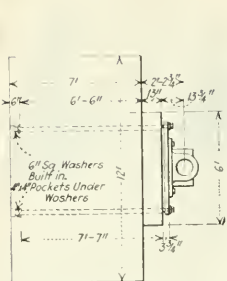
BOLT DRAWING OF ENGINE FOUNDATION
